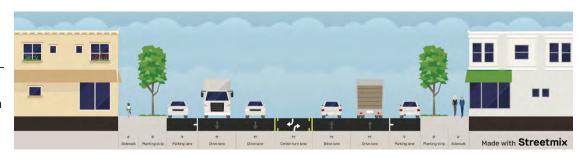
GRAND AVENUE FROM 8TH TO 13TH STREET
